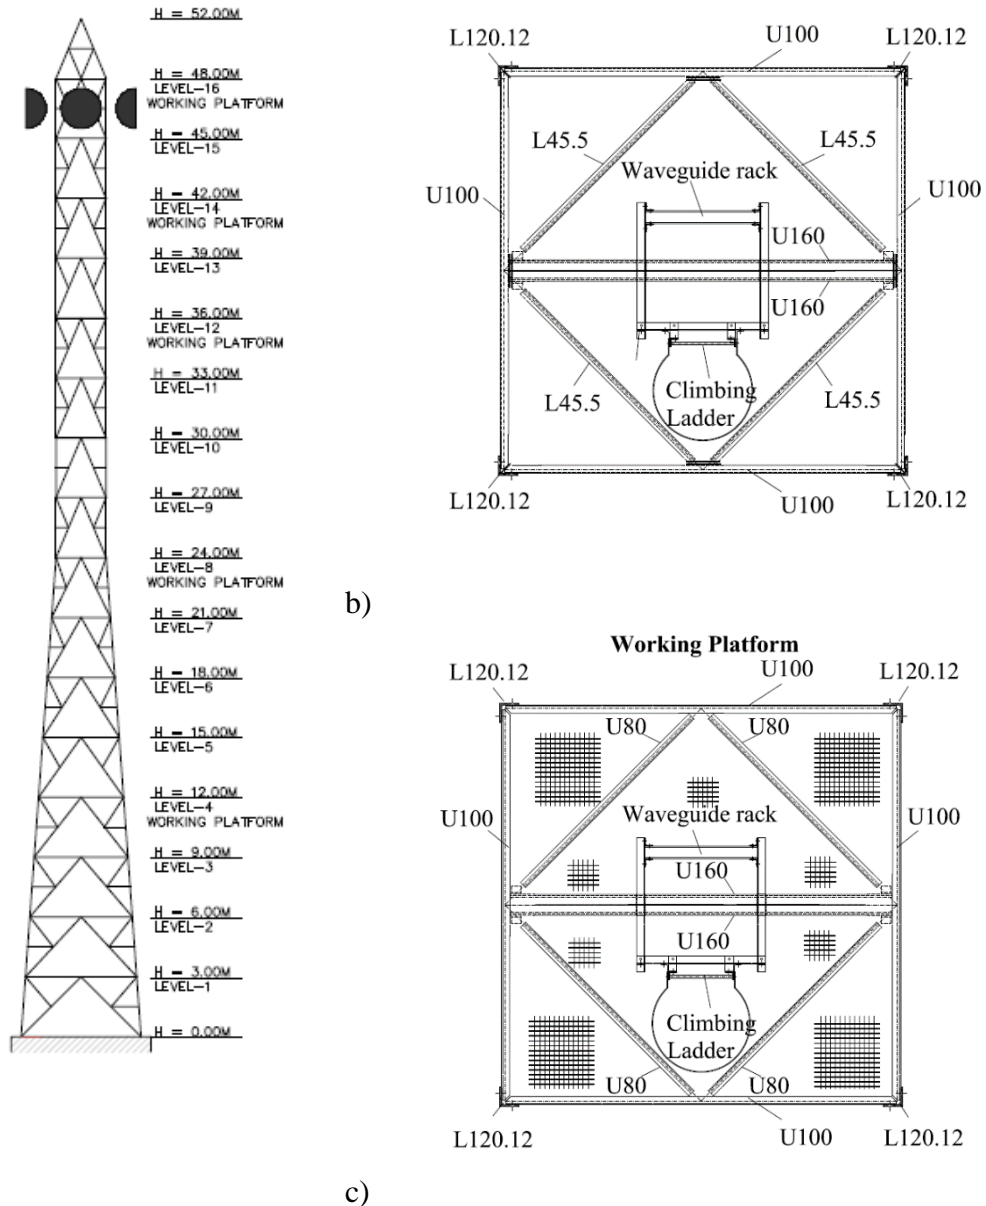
a) Tower elevation; b) typical plan of a horizontal diaphragm; c) typical plan of a working platform [22].
